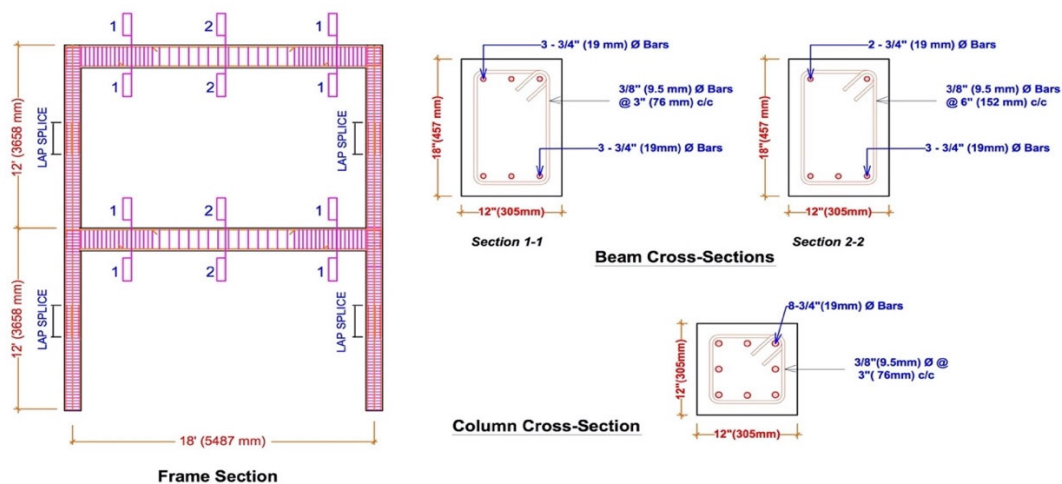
Geometric and reinforcement details of the prototype reinforced concrete moment-resisting frame.
